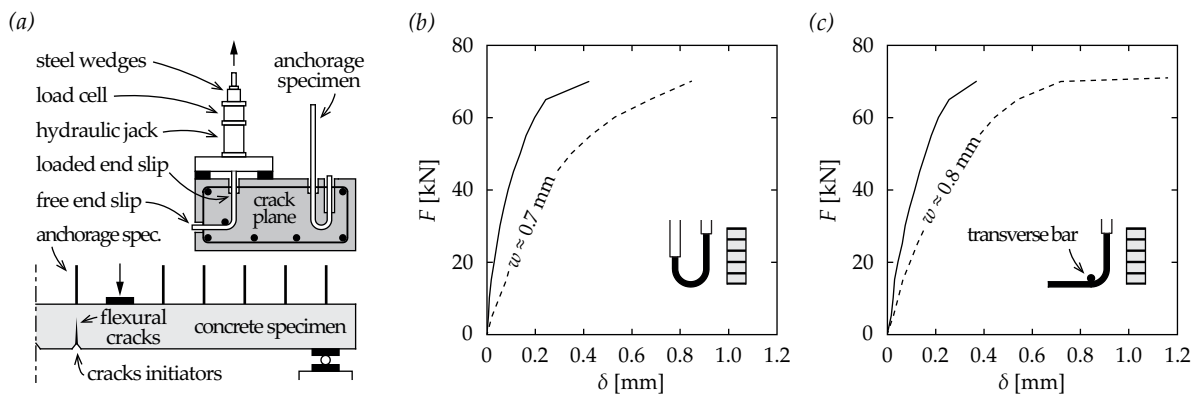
Bend bar details in cracked concrete (adapted from [Reg80b]): (a) test setup; (b) force-slip relationships of a hook; and (c) force-slip relationships of a 90° bend with transverse bar (solid lines: uncracked concrete, dashed lines: cracked concrete)
